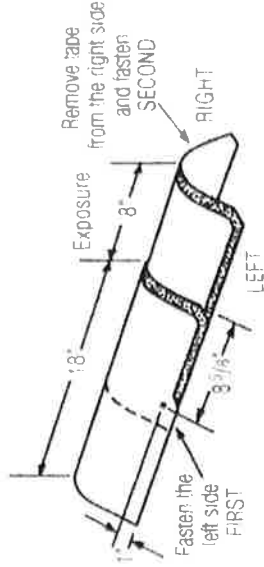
Installation of Shangle® Ridge shingles on hips and ridges.
